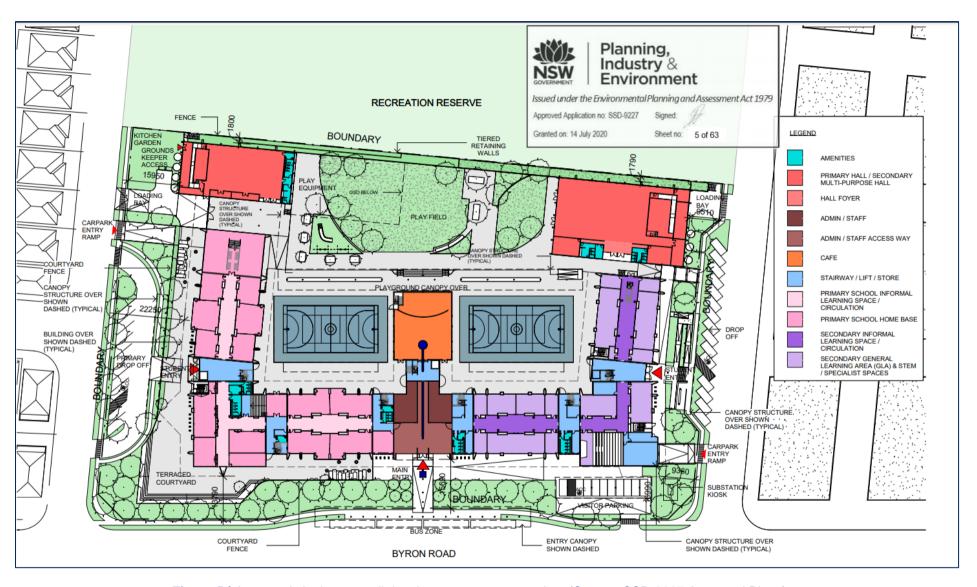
| Approved site layout – all development stages complete (Source: SSD-9227 Approved Plans)
